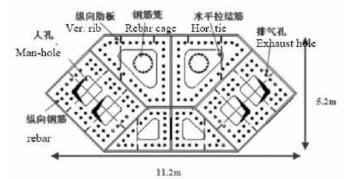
Typical low zone 45m<sup>2</sup> Mega Column section detail 图8. 底部典型楼层巨型角柱45m<sup>2</sup>截面构造示意图
